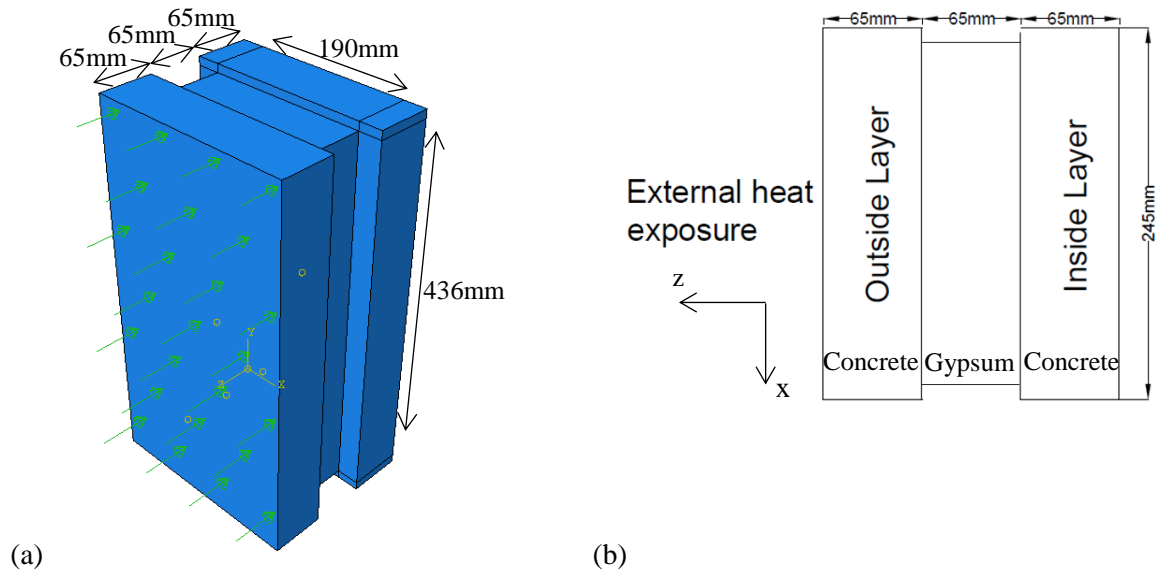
Diagram of layered concrete and gypsum layered element (units in mm).
